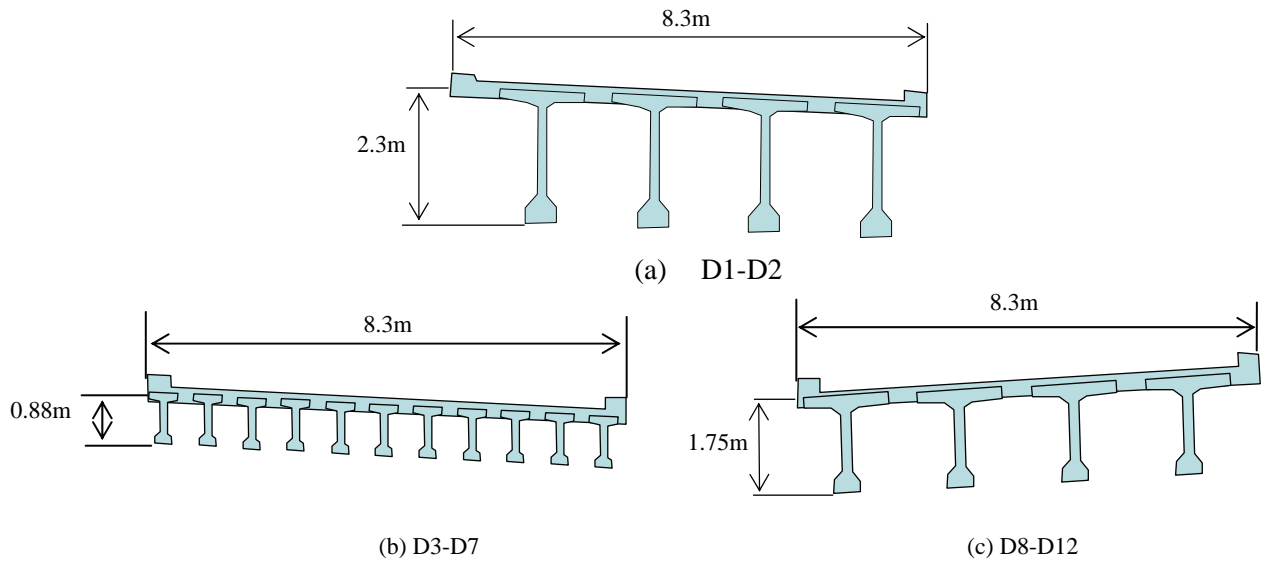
PC Deck Sections, Utatsu Bridge (the left and right correspond to the land side and sea side, respectively, when viewed from Sendai side)
